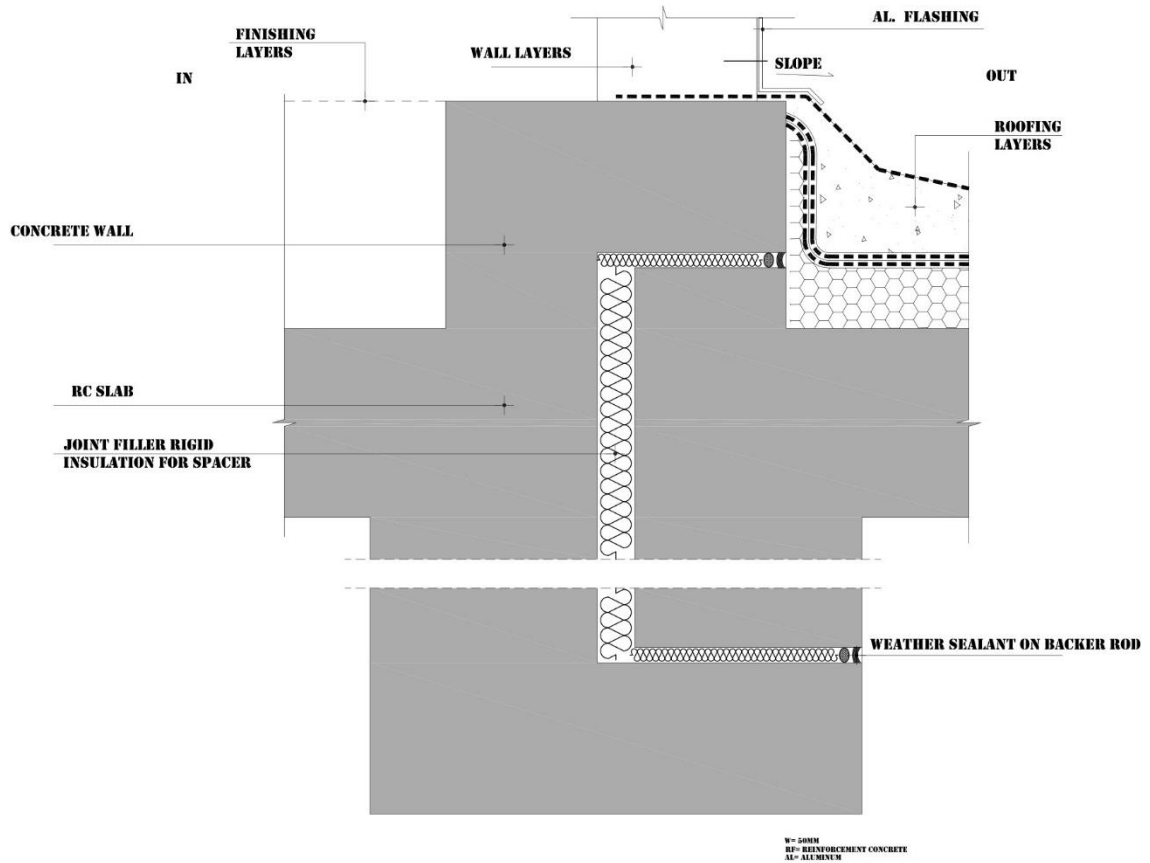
EXPANSION JOINT- FLOOR TO FLOOR
